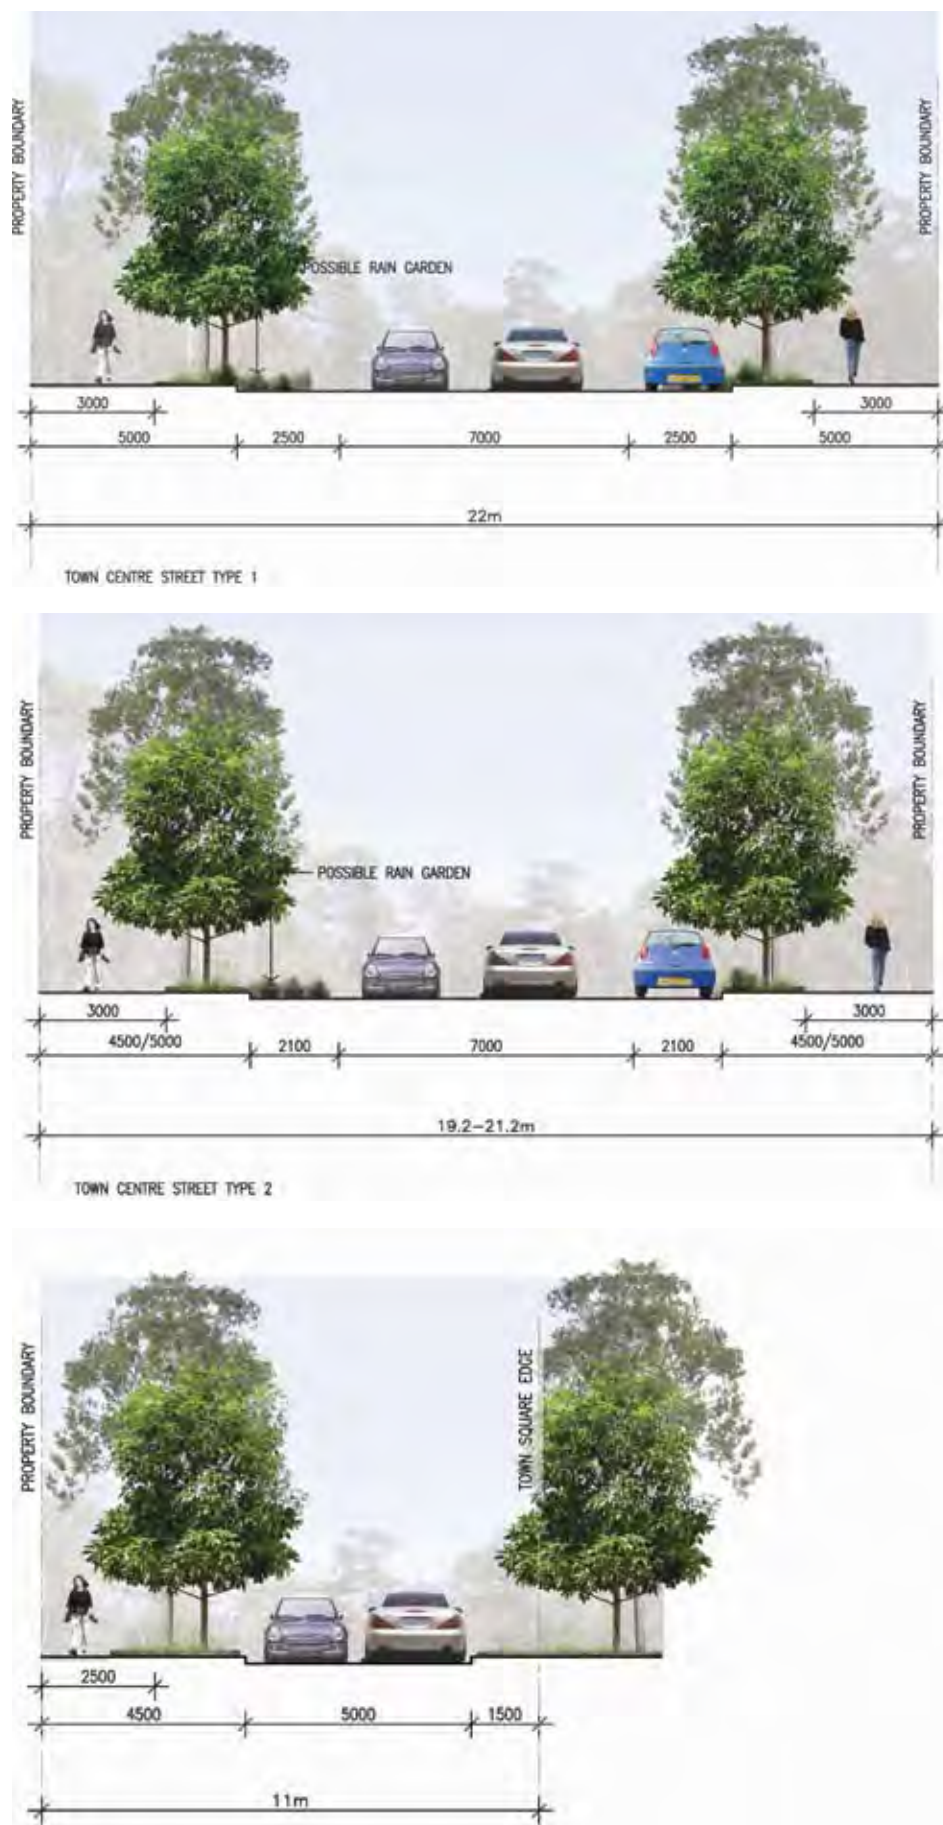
Stage 1 Town Centre - Road Carriageway and Reserve Widths
